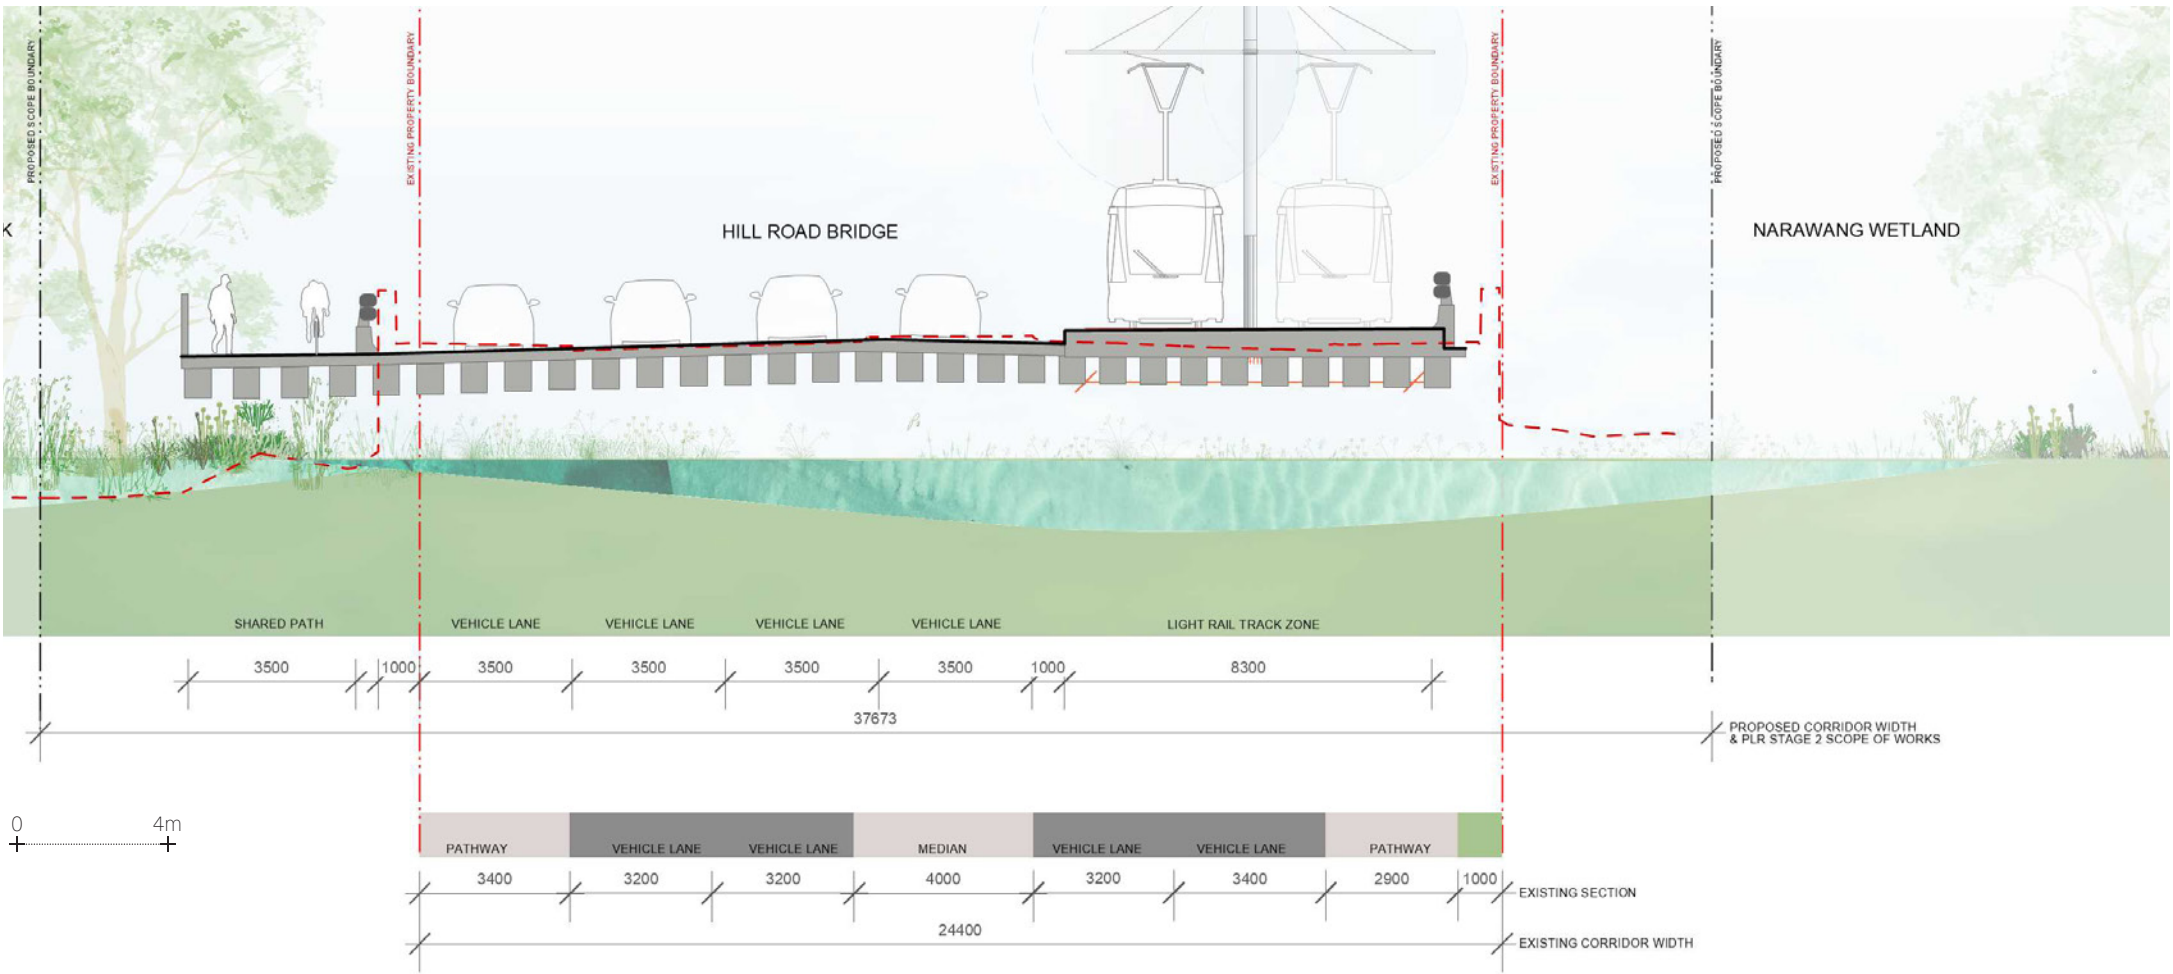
Cross section 20 - Hill Road bridge over Haslams Creek (indicative only - subject to design development).
